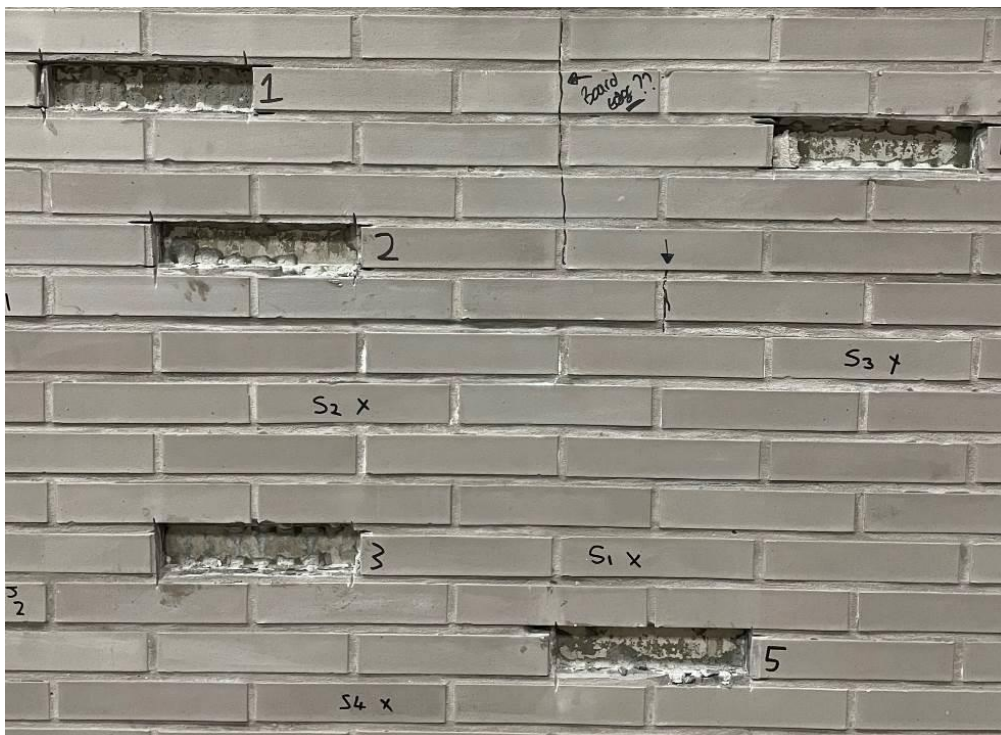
Bond Strength Failures on HURST TRACKWALL Brick Slip Cladding System
